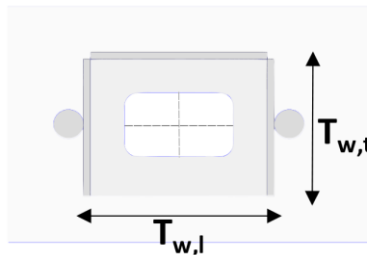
Installation tolerances for RSK-E wall shoe
